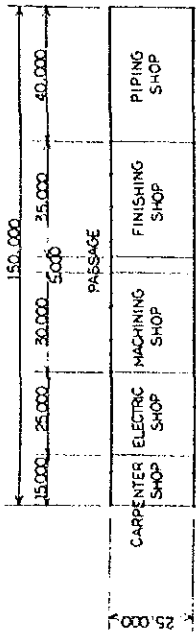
GENERAL ARRANGEMENT - OF STEEL SHOP
